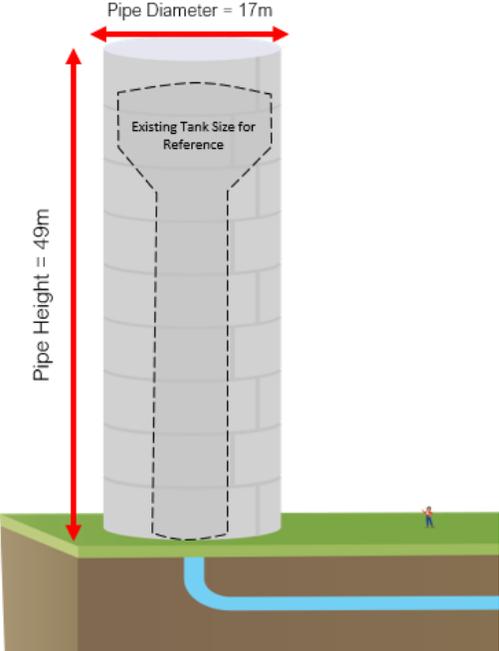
Alternative 4: New Standpipe to Replace Existing Elevated Tank
